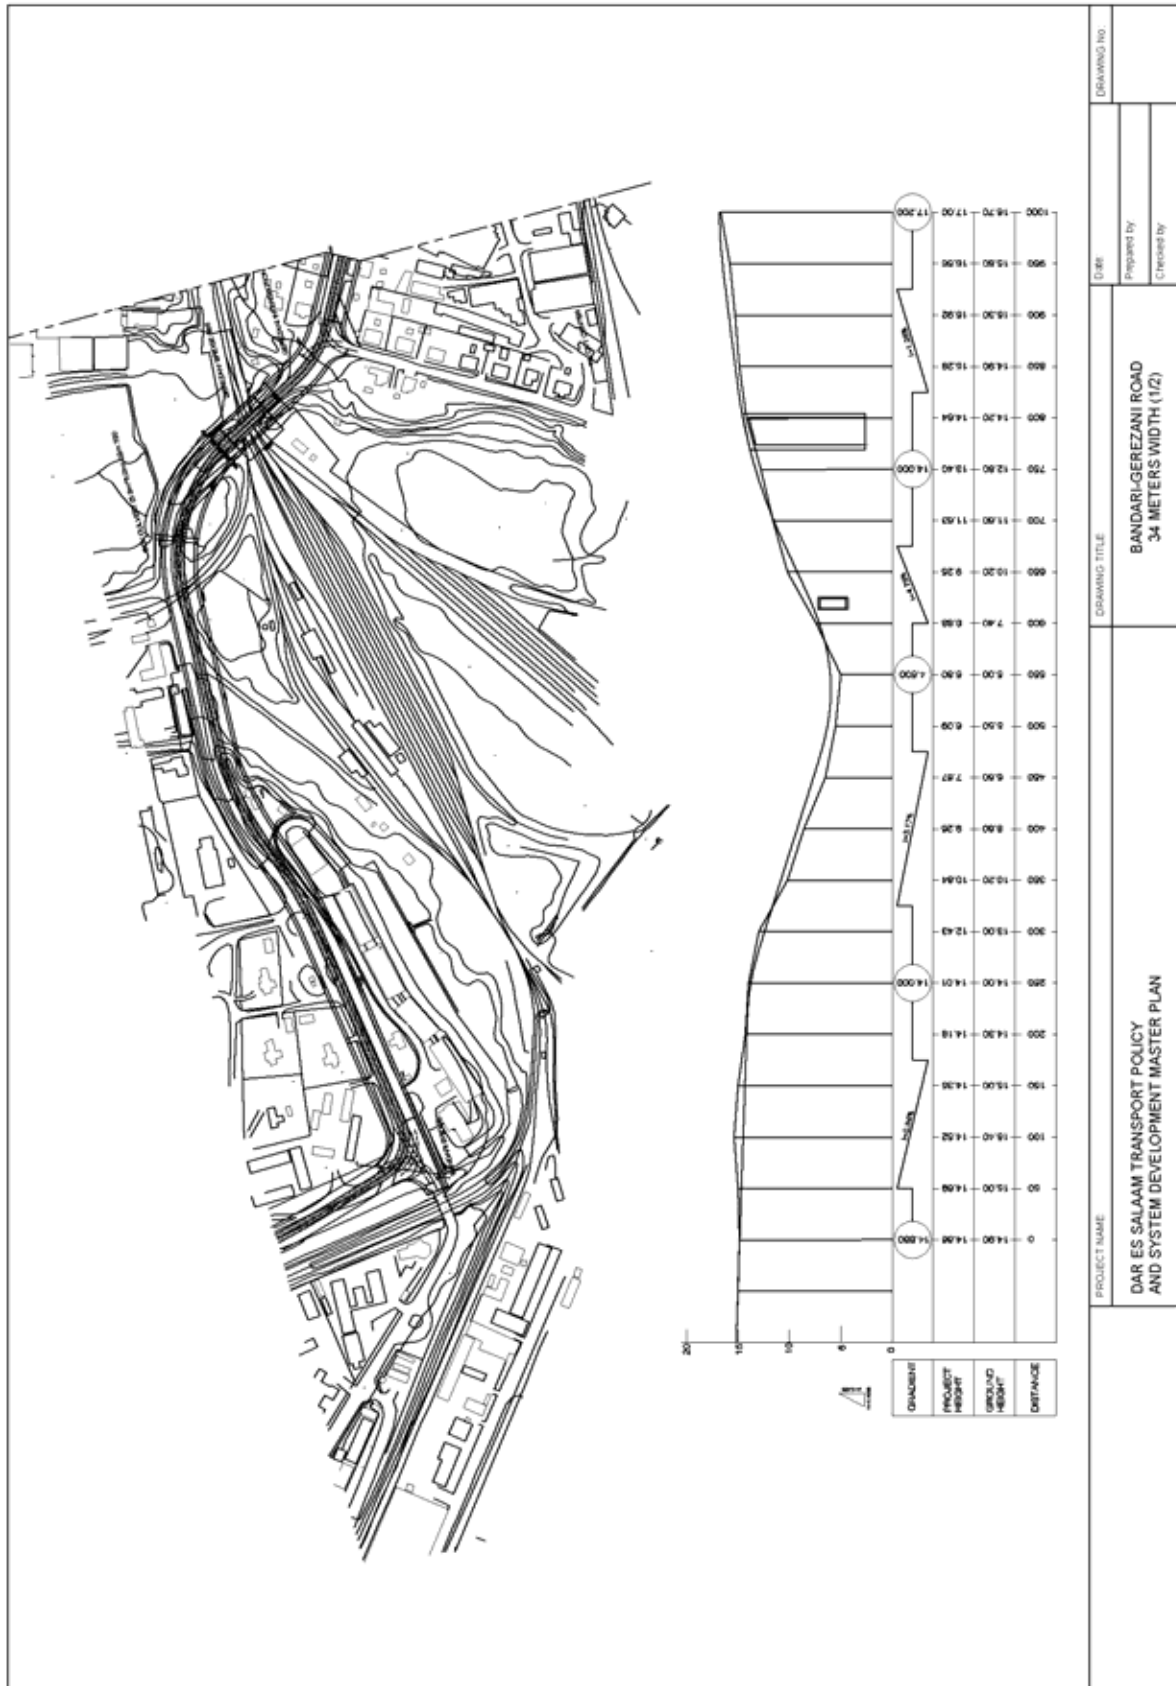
Bandari – Gerezani Road (6-lane)
